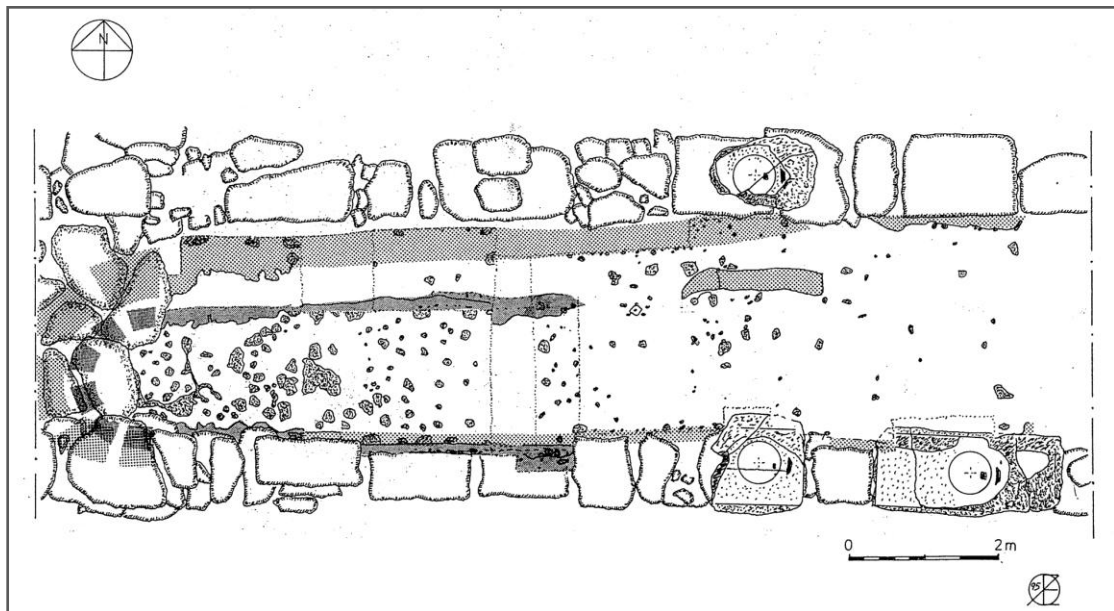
Plan of the two Geometrical cult buildings as indicated by the actual remains. Building 1 (lighter) and Building 2 (darker) among the foundations of the Archaic inner colonnades (Drawing: Østby) (Østby, 2014a: 20)
